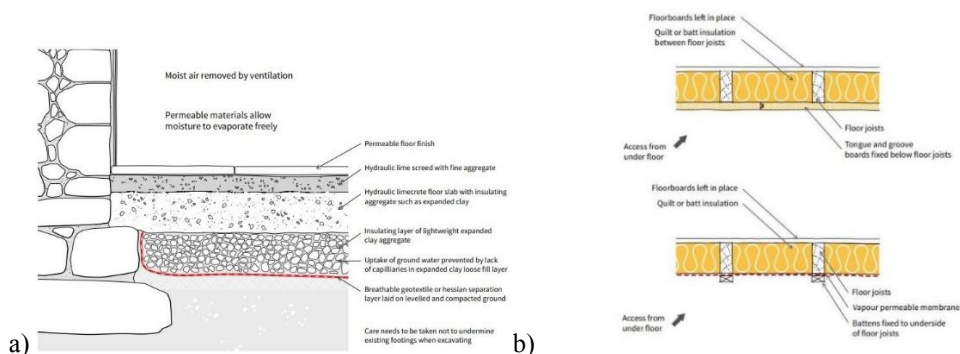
Recommended solutions for slabs and floors in historical buildings: a) solid floors; b) suspended or intermediate floors.
